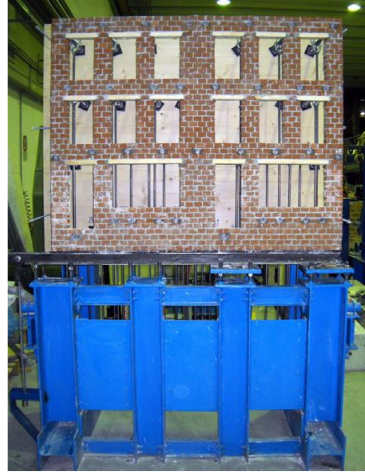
The wall specimen built on a steel beam (Source: Giardina et al., 2012).
